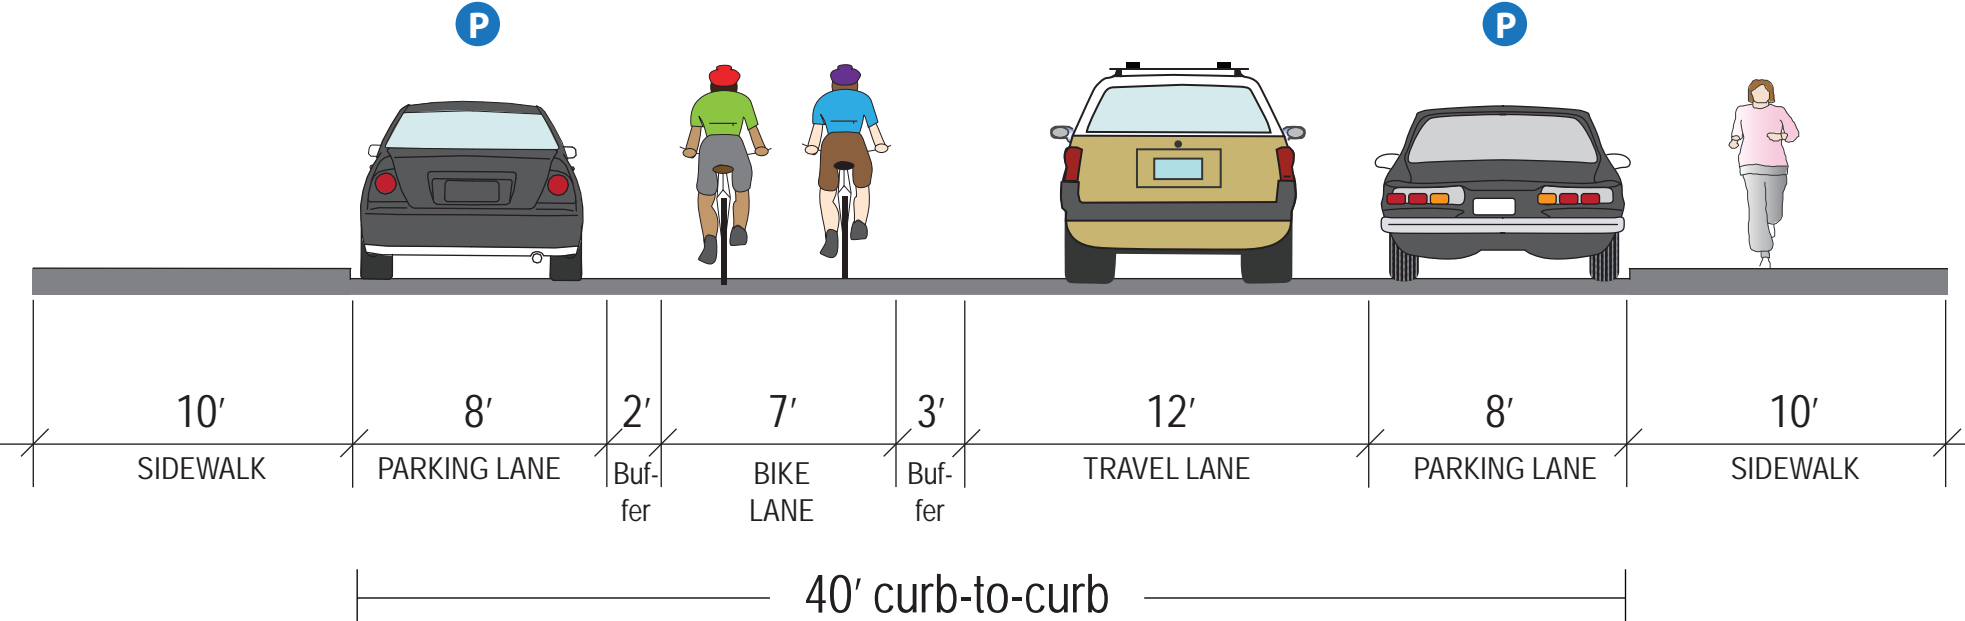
Existing street cross section between Hancock Street and Killingsworth Street
